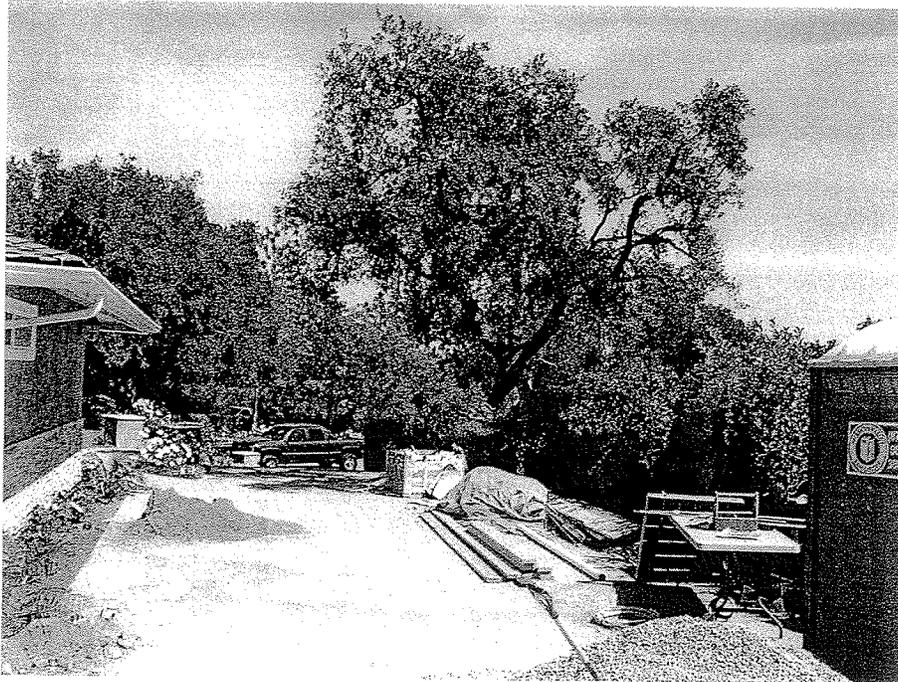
Photo B shows Oak #1. Built up soil within dripline should be removed and lower grades restored.
